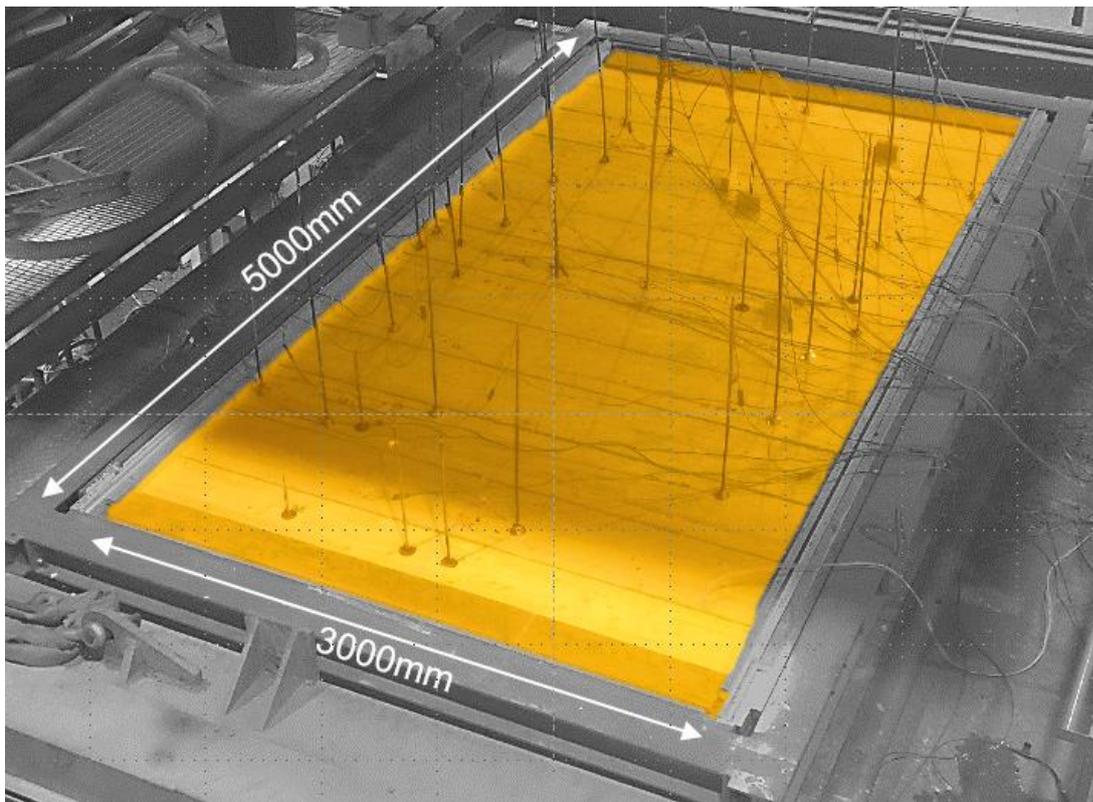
Test specimen installed on the horizontal full scale furnace at the fire lab of Rise.
